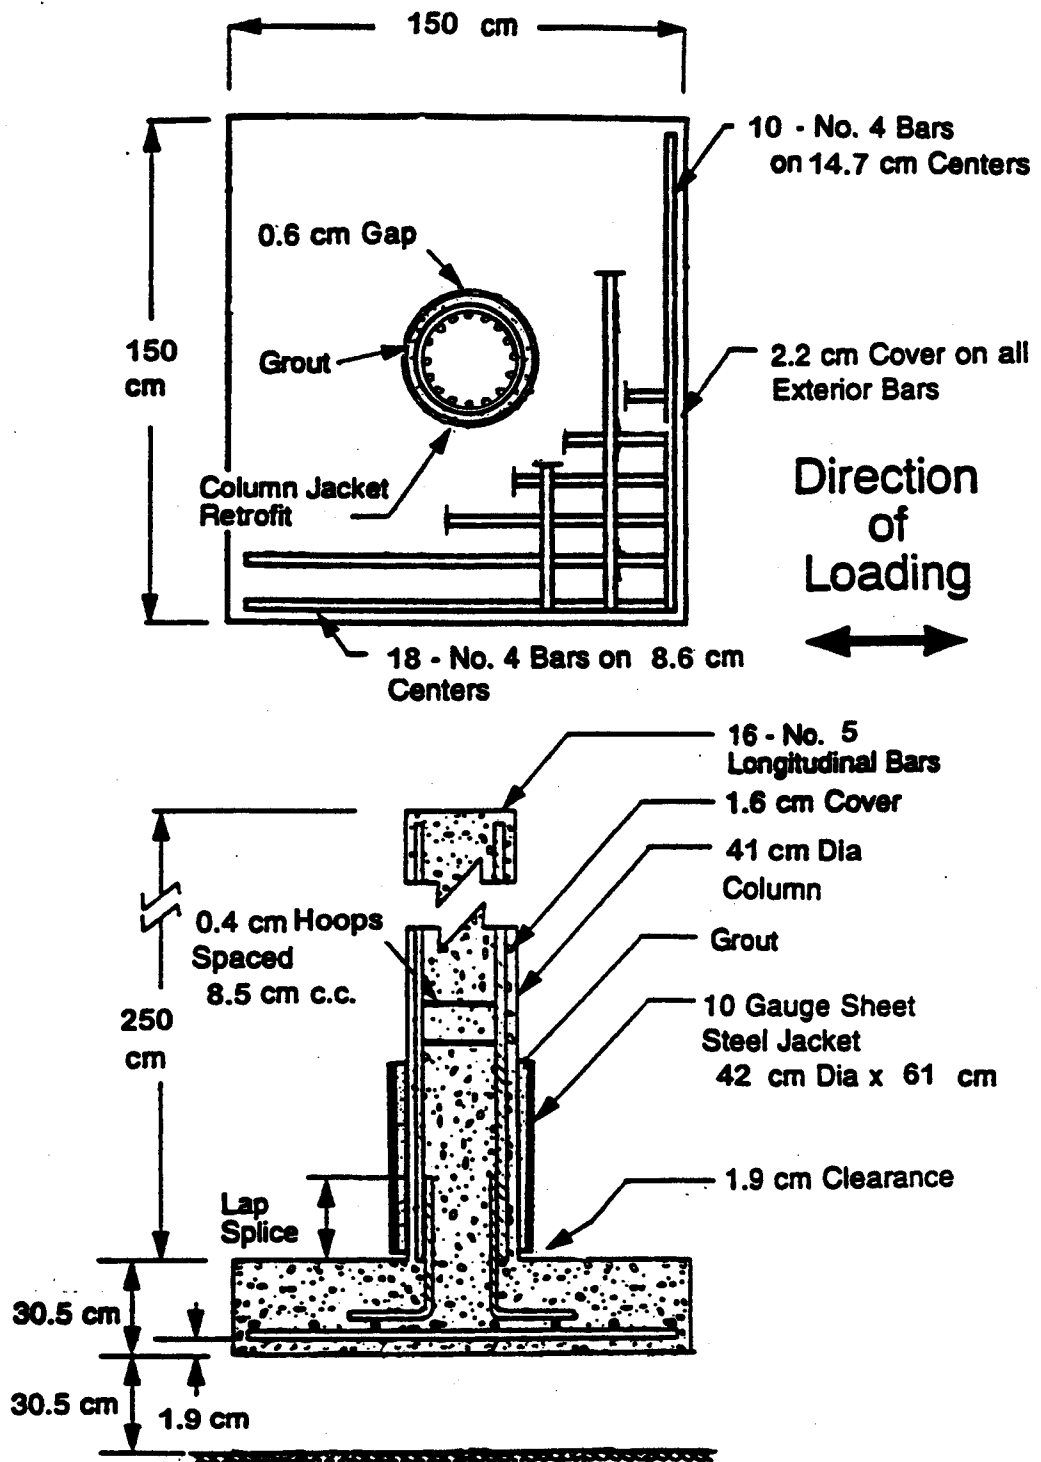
Details of Specimen No. S1 Representing the As-Built Spread Footing Specimen
